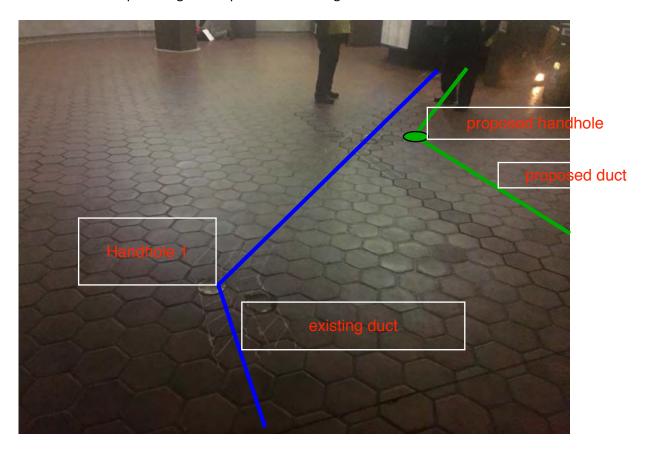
G02 Capitol Heights: Proposed and existing runs on mezzanine floor
